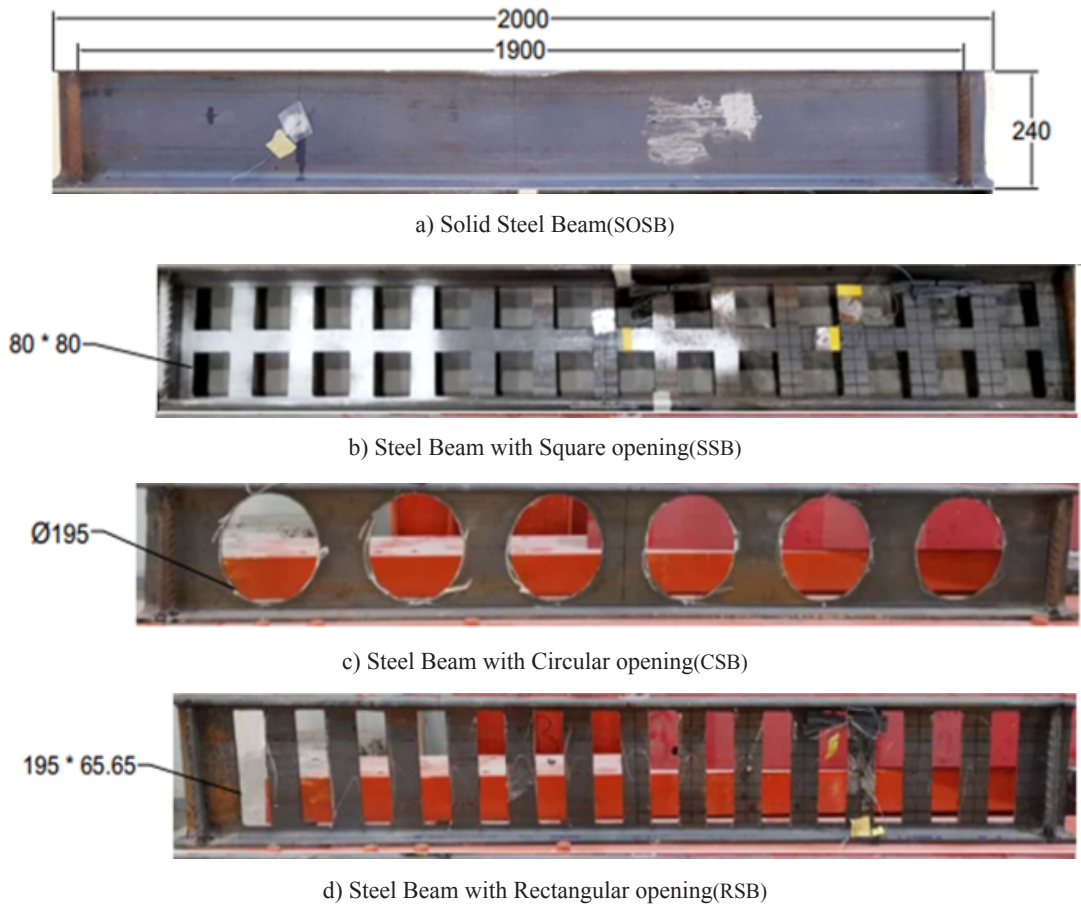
Arrangement and dimension of web openings in the steel section (all dimensions are in mm)
